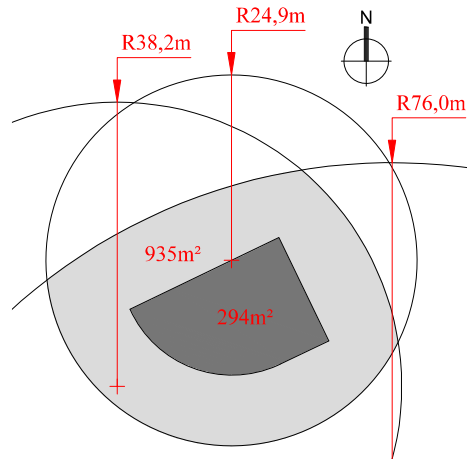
Canyon storey plan geometry (dark grey = core area / light grey = office area).
